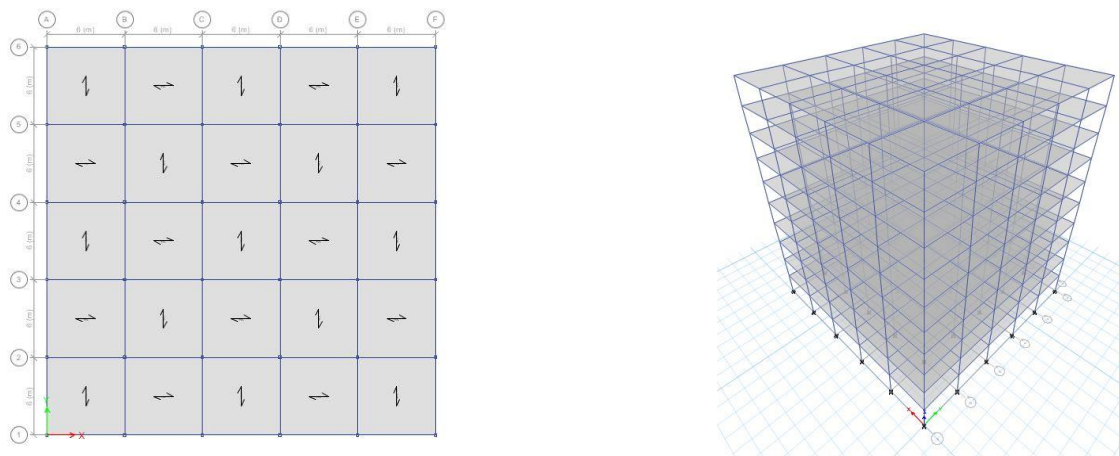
Three-dimensional view and floor plan of the 10-story building frame.
